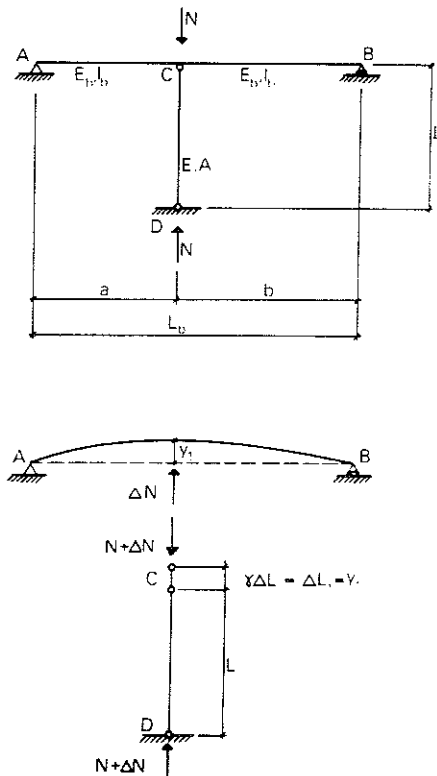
a. Fire exposed structure made up of a column CD hinged at its top end into a simply supported girder AB
